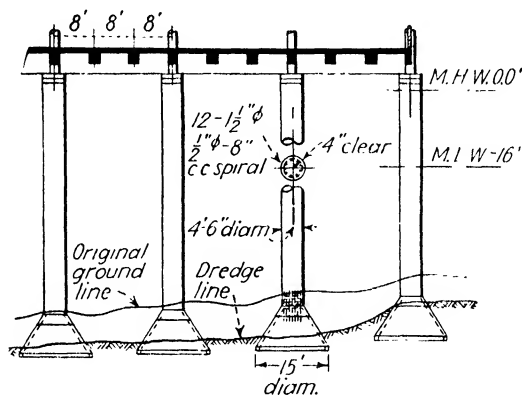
Concrete Cylinder Caissons Supporting Wharf in Seattle, Wash.
